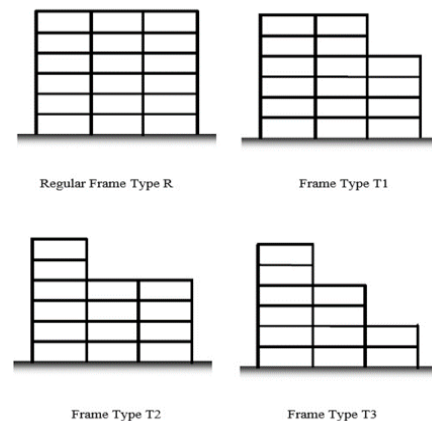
Typical Building Elevations for 6-storey Building Frames
